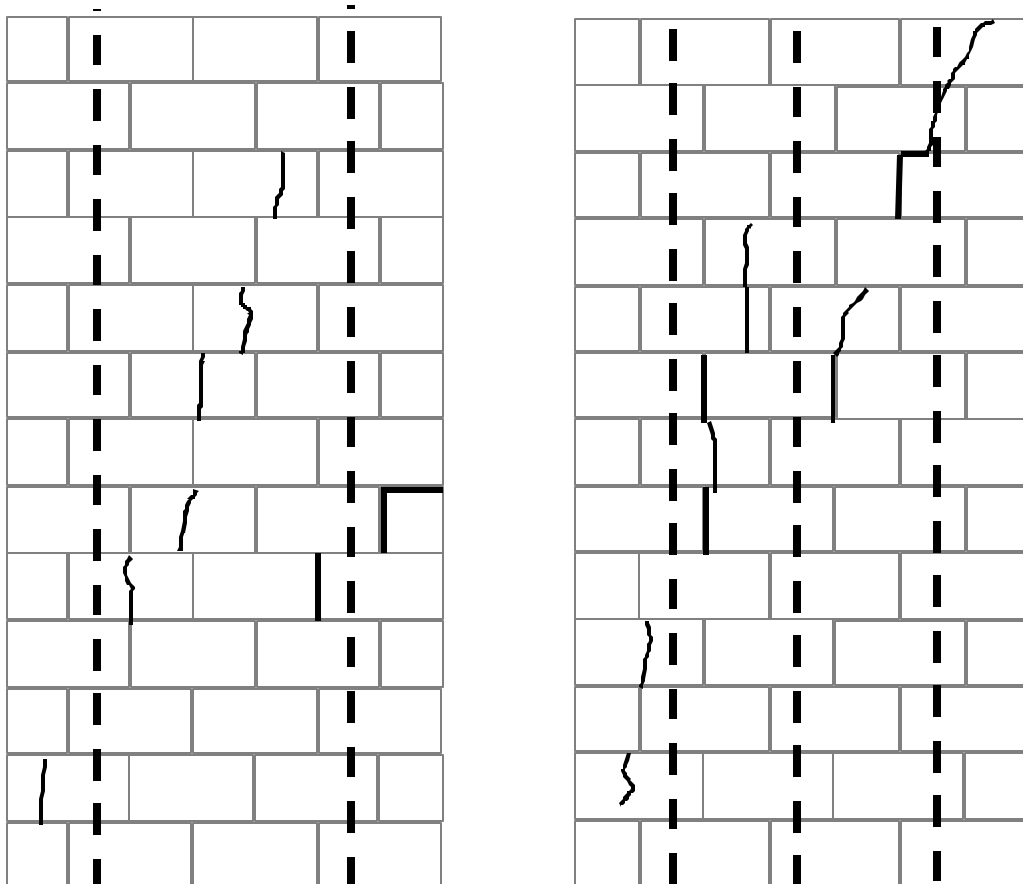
Cracking and Slippage Locations for 56 inch Wide Wall Assemblies
